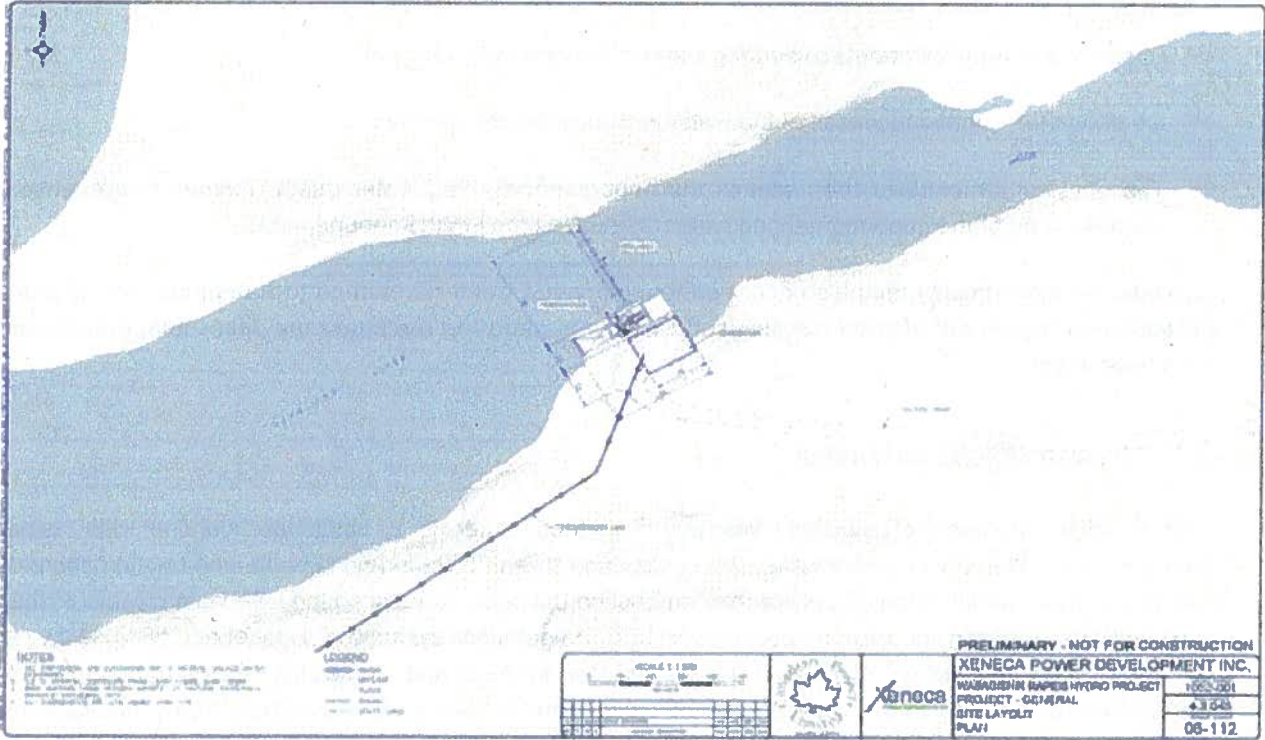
The layout of the proposed Wabageshik Rapids hydroelectric facility.
